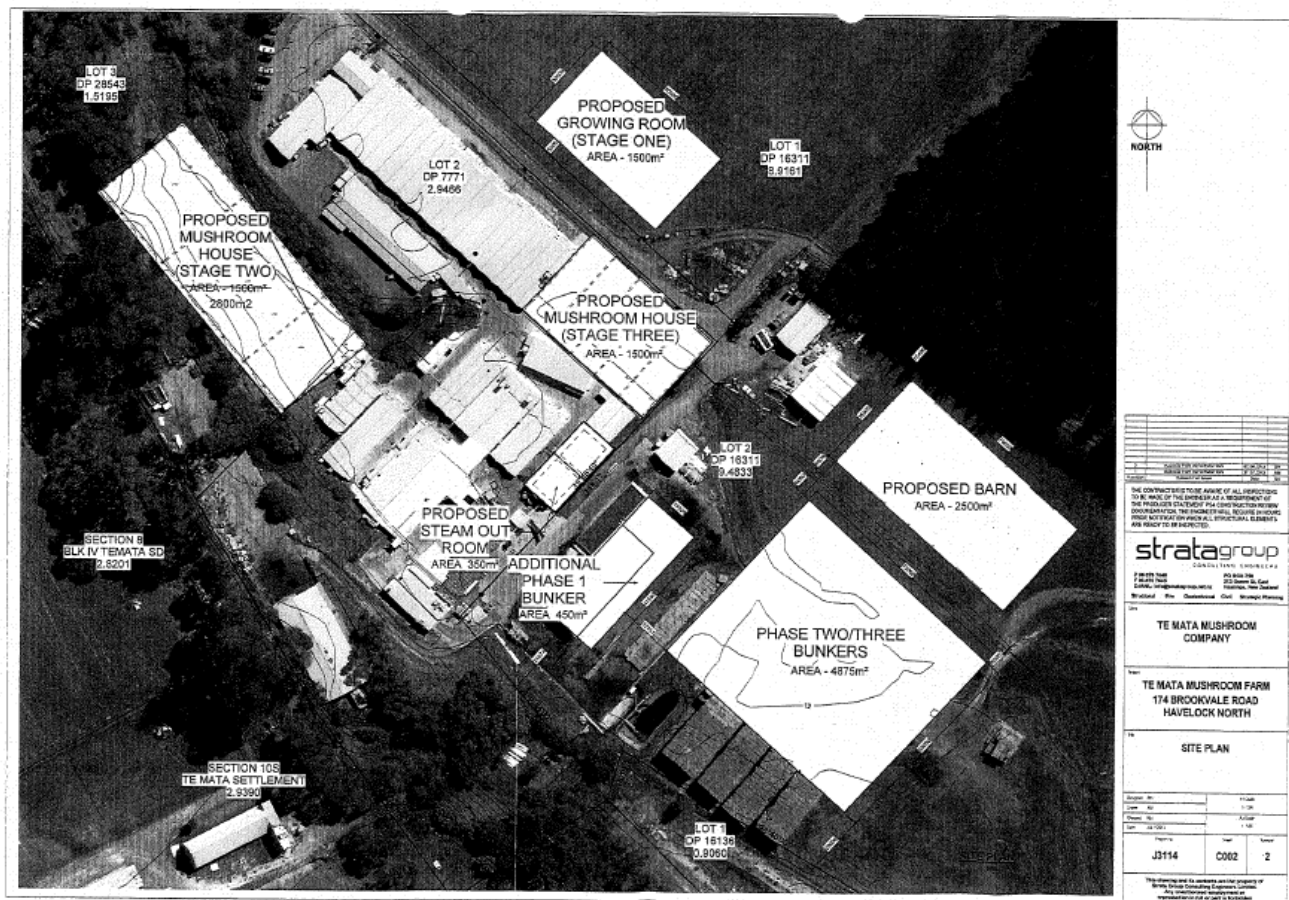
Site layout of the current and proposed mushroom farming buildings (Cheal consent application, additional information, August 2013)
